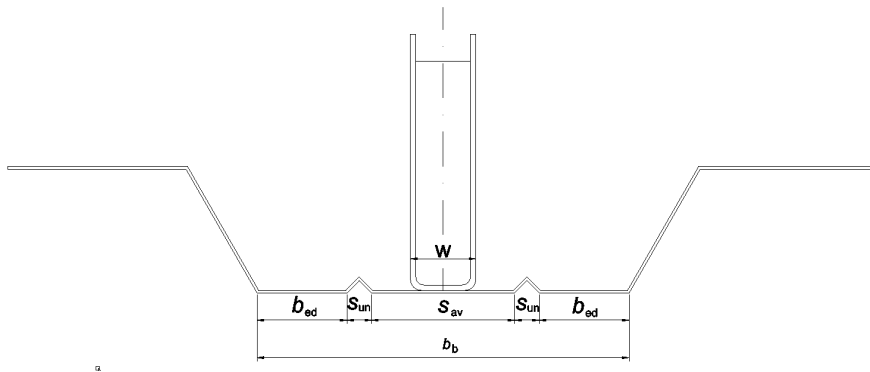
Transverse sheeting with two rib stiffeners and transverse connectors.
